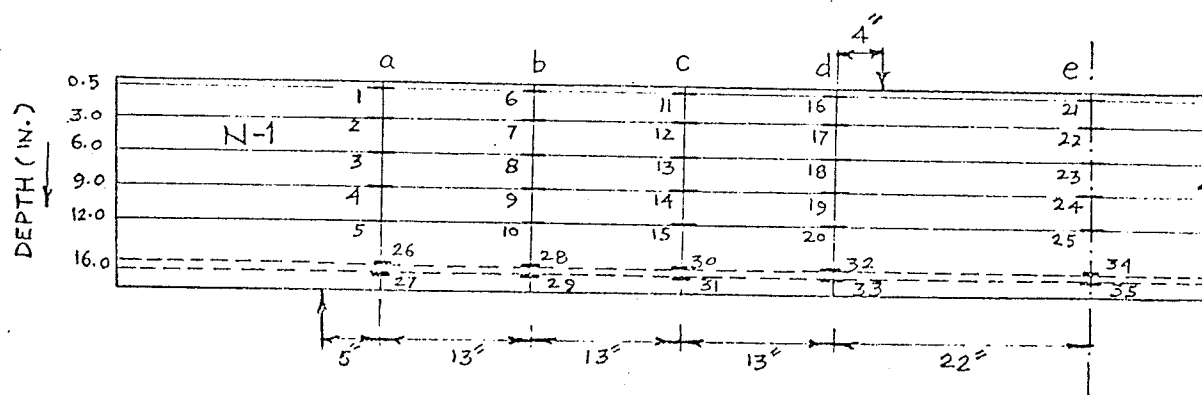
GAUGE LOCATIONS ON BEAM IB-5
